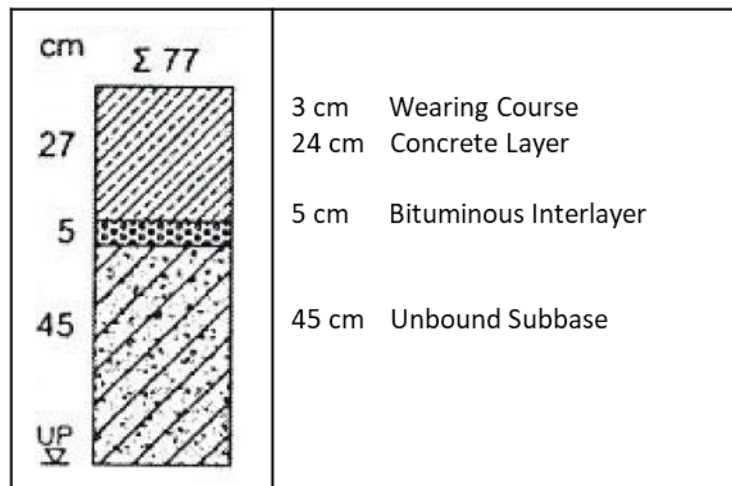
Concrete pavement according to RVS 03.08.63 [49]
